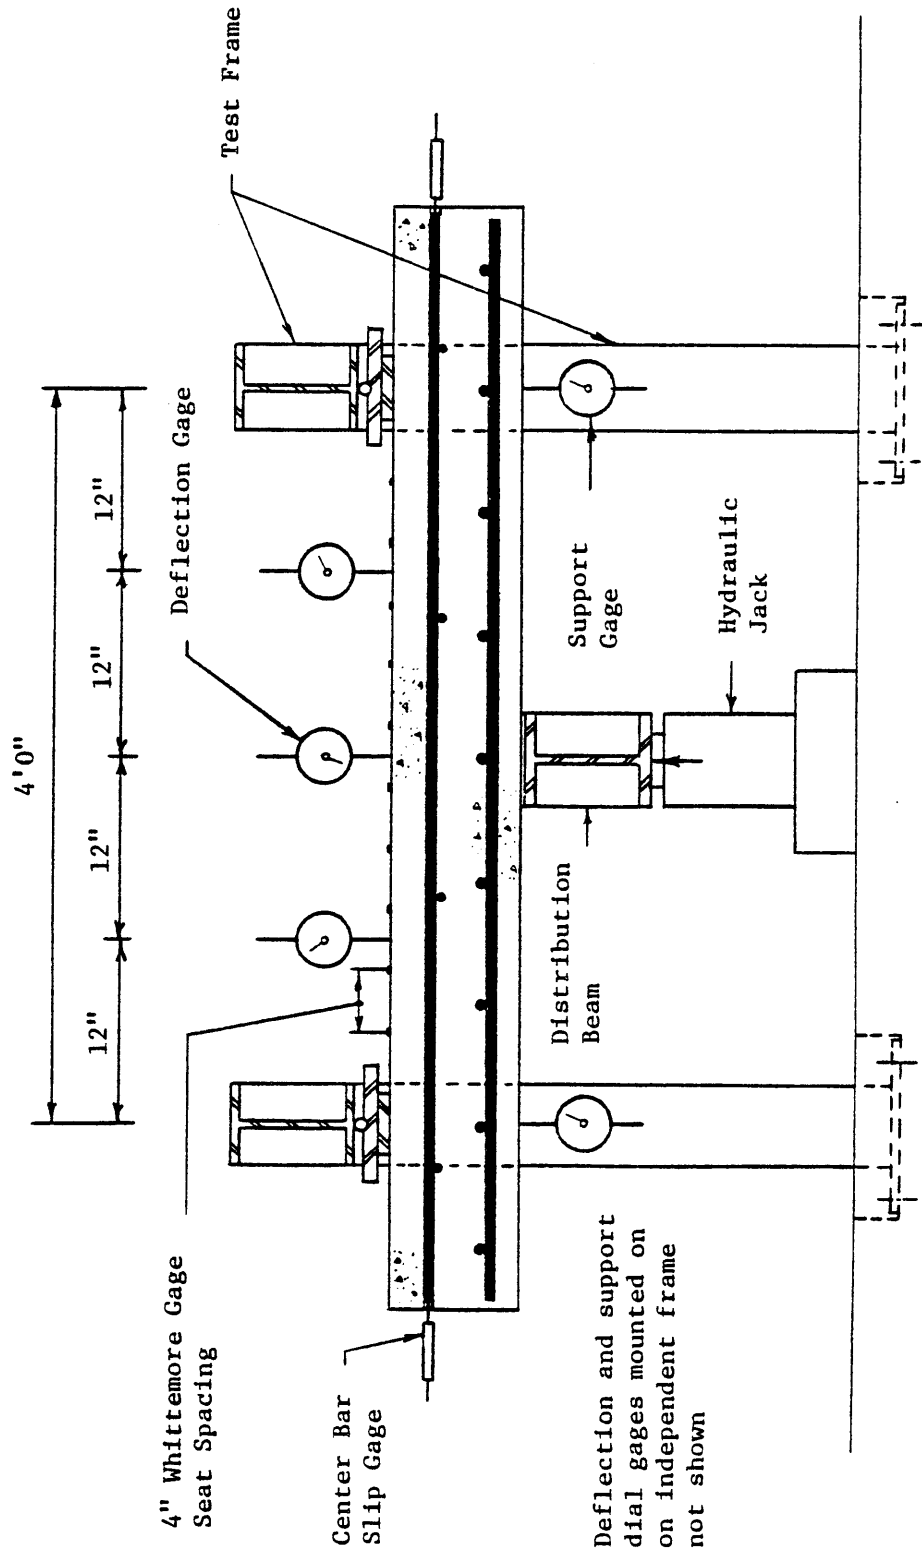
Side Elevation of Slab Specimen Test Arrangement
